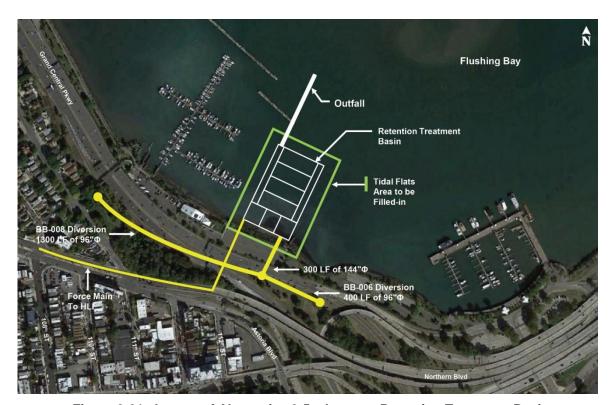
Layout of Alternative 9-5 - In-water Retention Treatment Basin
